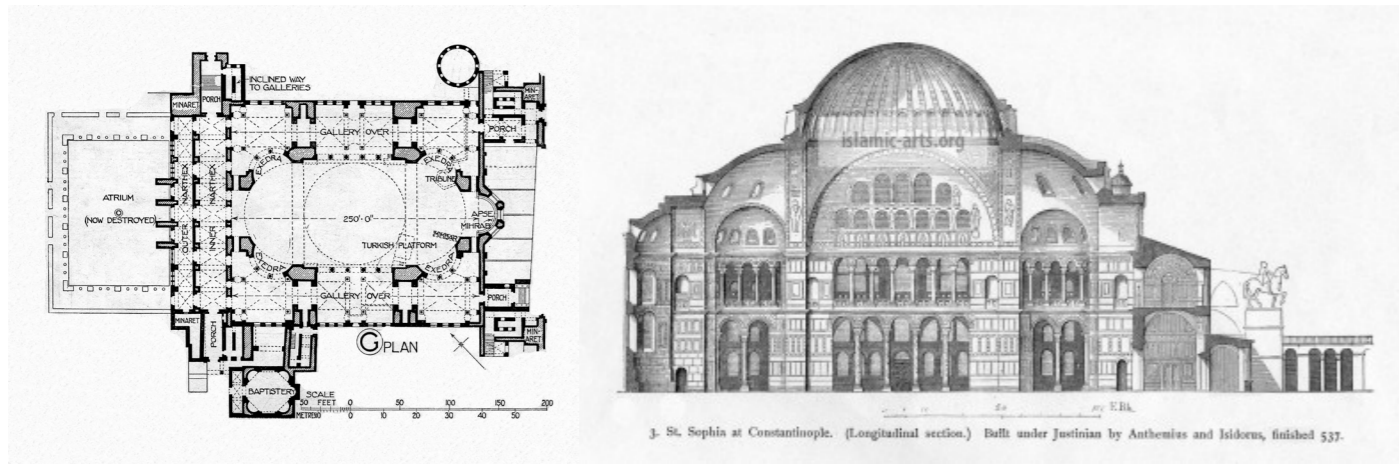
Floorplan and Elevation of the Hagia Sofia.
